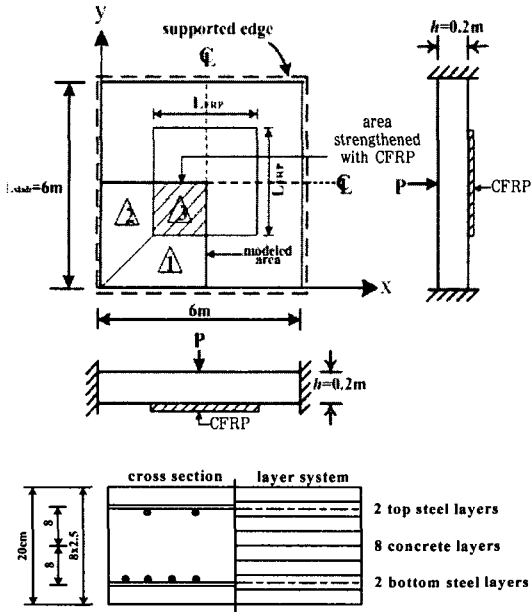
Simply supported RC slab strengthened with CFRP sheet: geometry, reinforcement and finite element mesh
